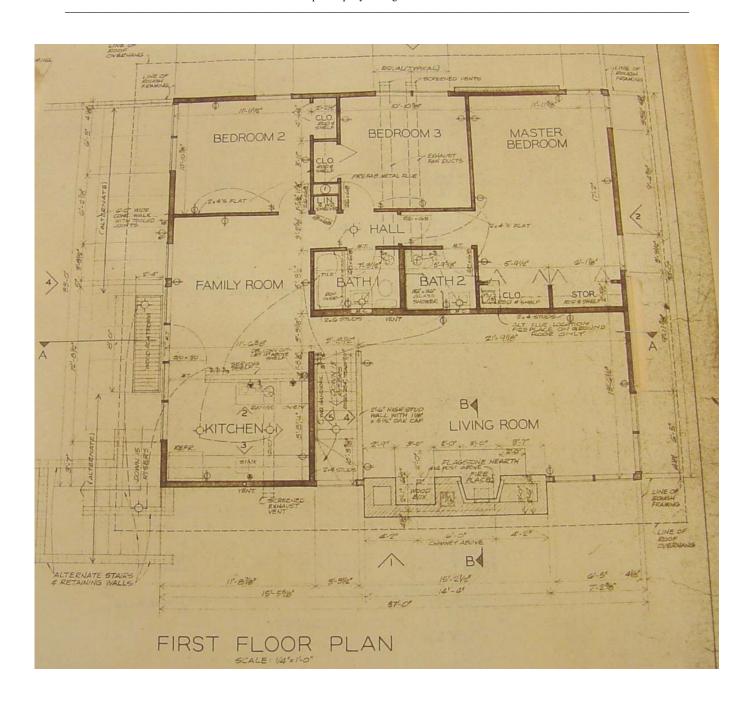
First Floor Plan, Crest Park, Type BC-2U-2
